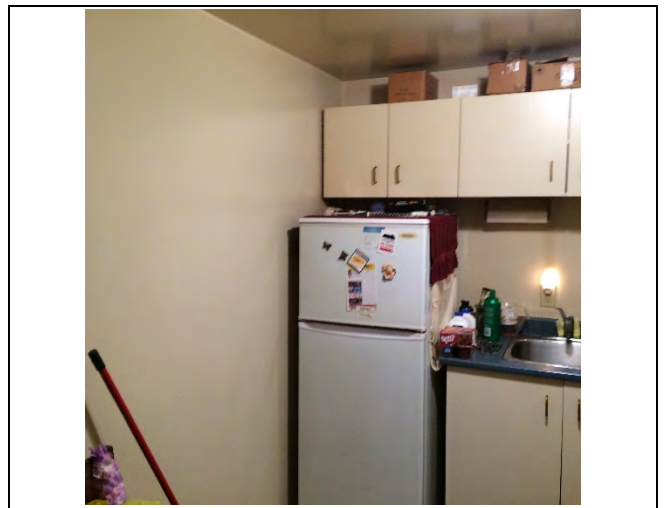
Drywall joint-fill compound is identified to be asbestos-containing (1% Chrysotile).
